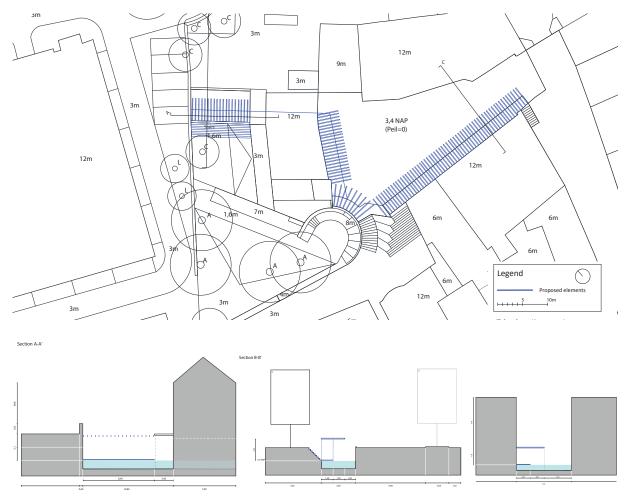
Design with final proposed elements (in blue) including sections and stripped down layout for processing into ENVI-met software.
